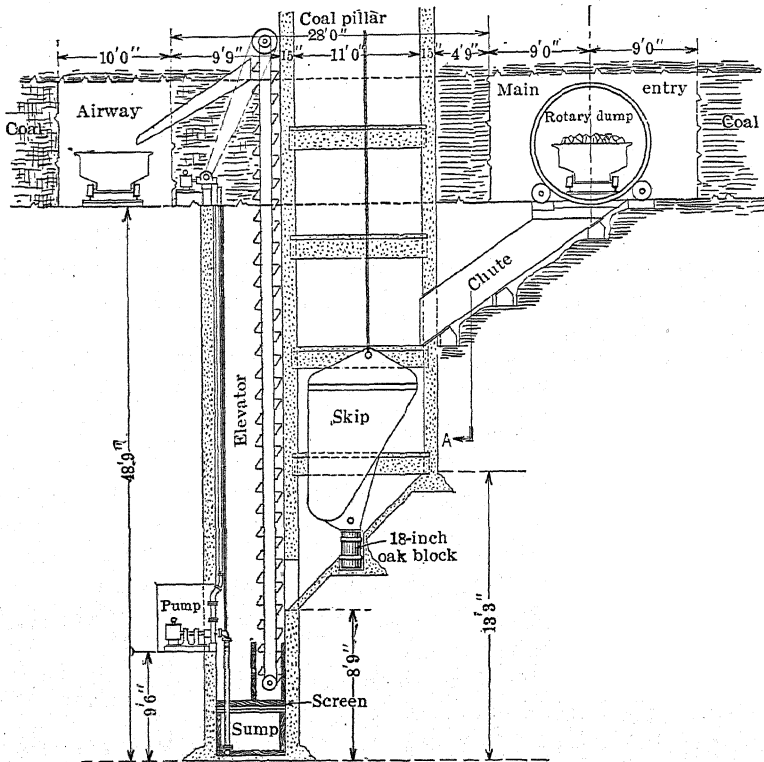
ELEVATION OF SHAFT BOTTOM AT VALIER.
